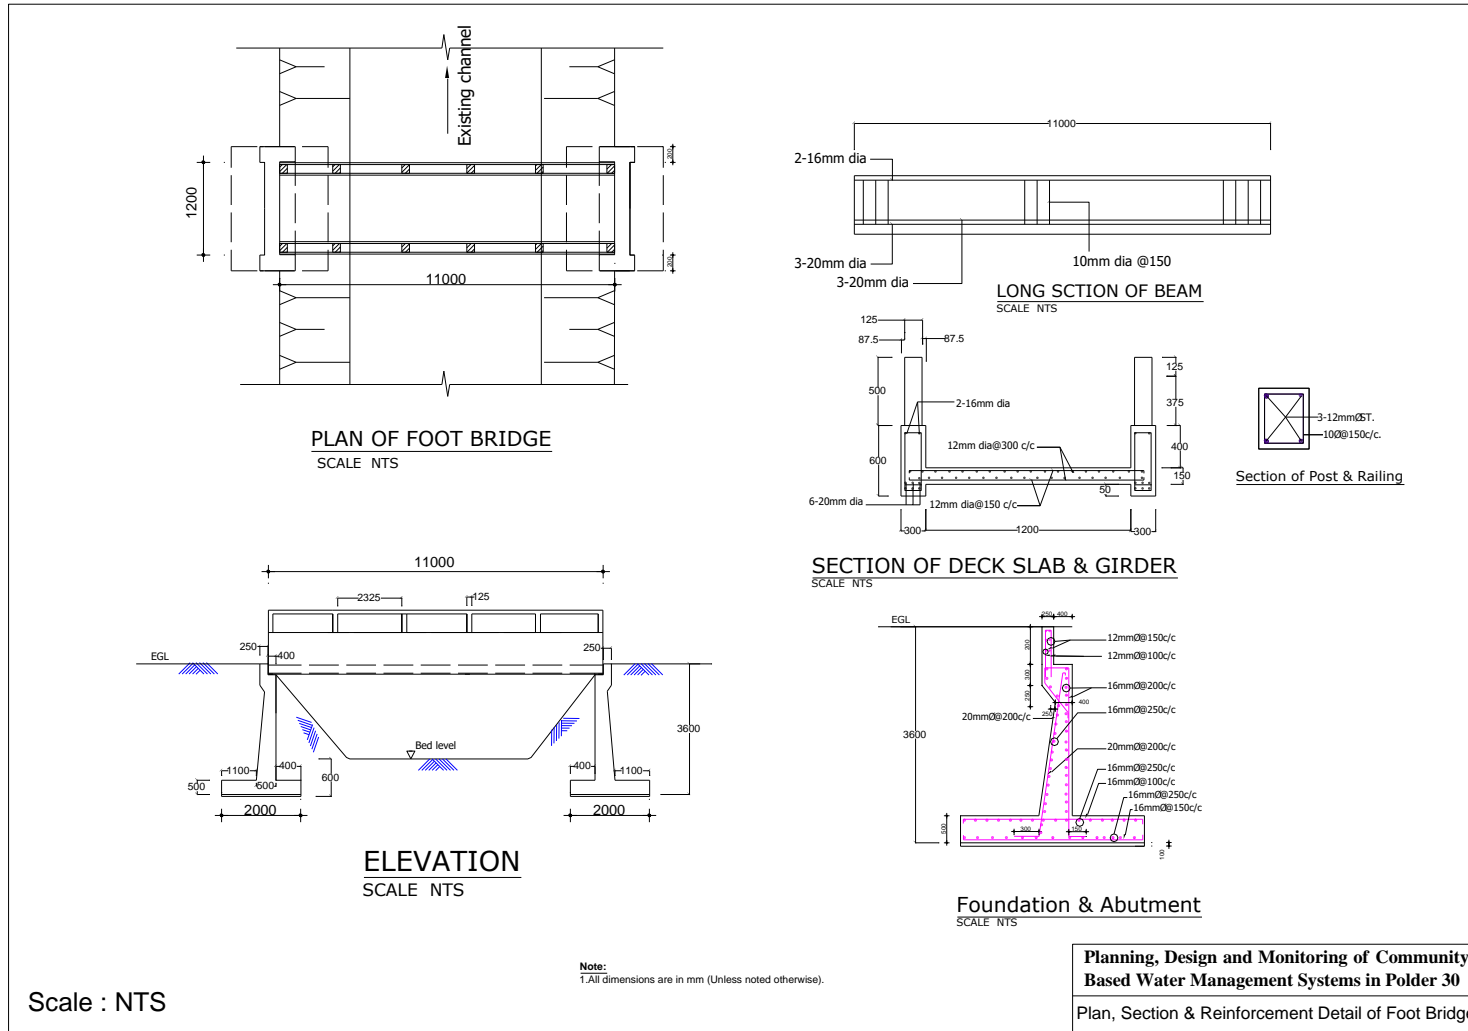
Plan, Section and reinforcement detail of Foot Bridge
